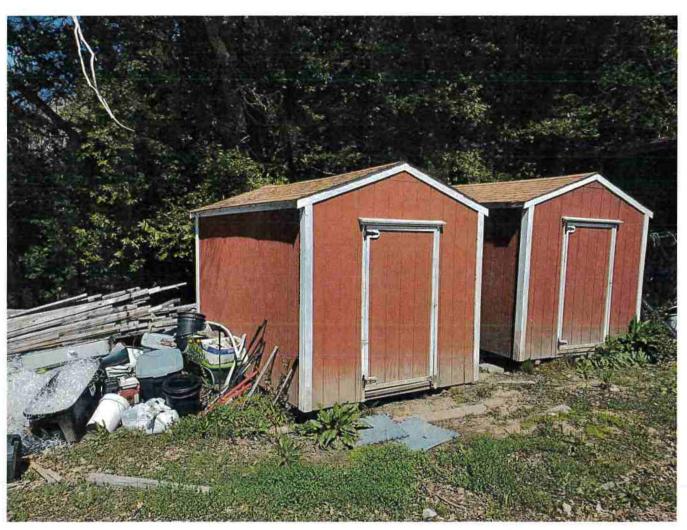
Two of 3 storage buildings on site. Looking North, from North side of Western graded flat.
